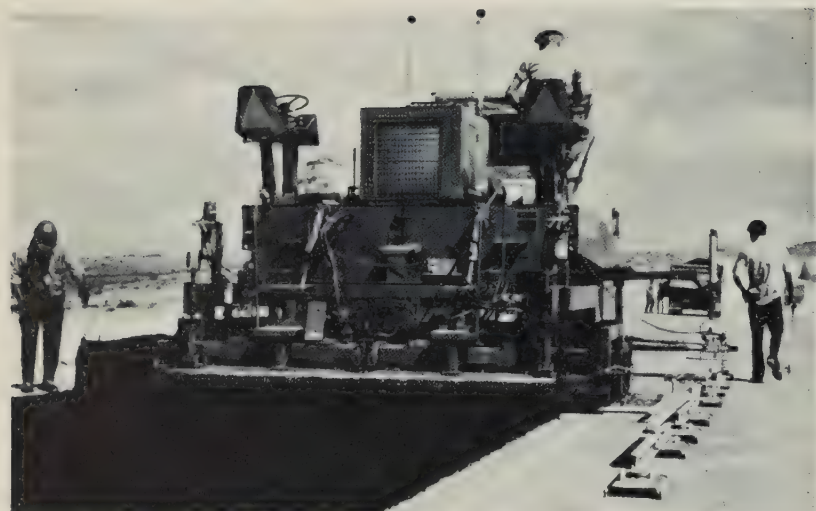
It looks like a new pavement, but will it give service in proportion to the investment? Should more be spent first on restoration of existing pavement structure?
